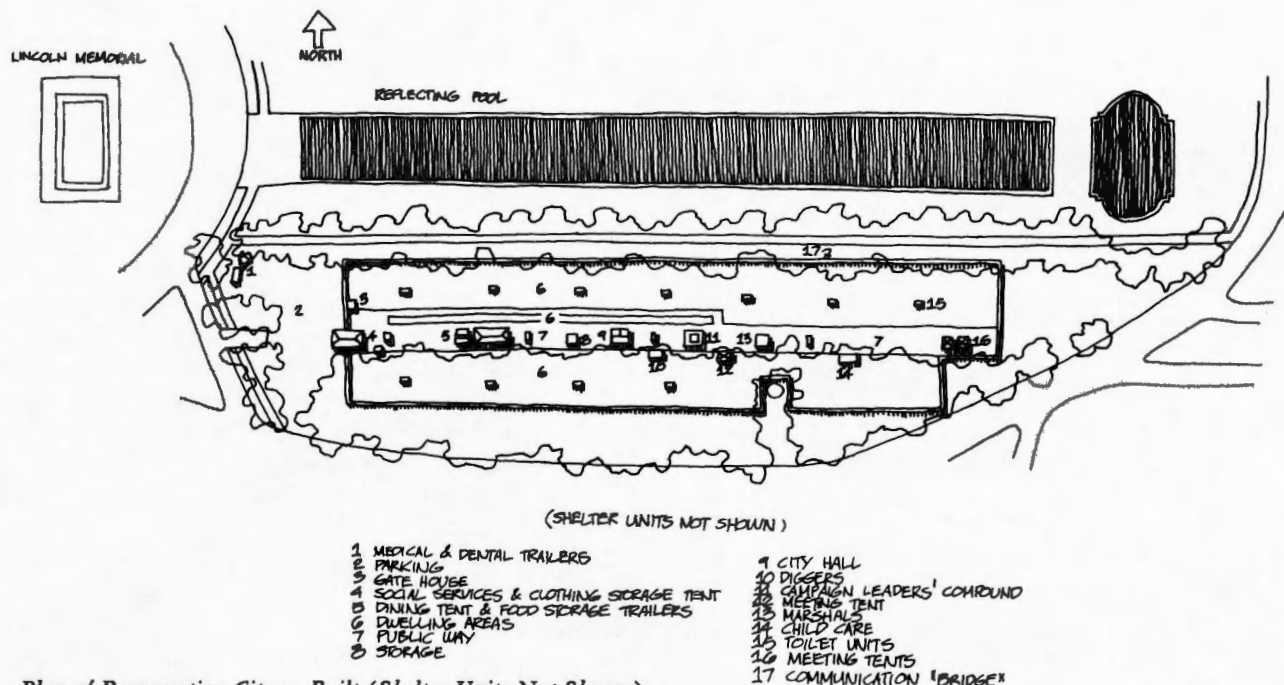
Plan of Resurrection City as Built (Shelter Units Not Shown)
